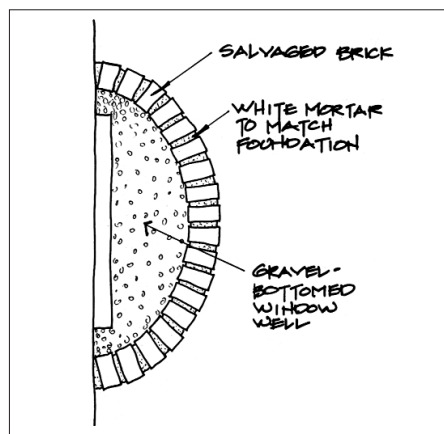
The arched window well, made from salvaged brick, used white mortar that matched the foundation mortar.
